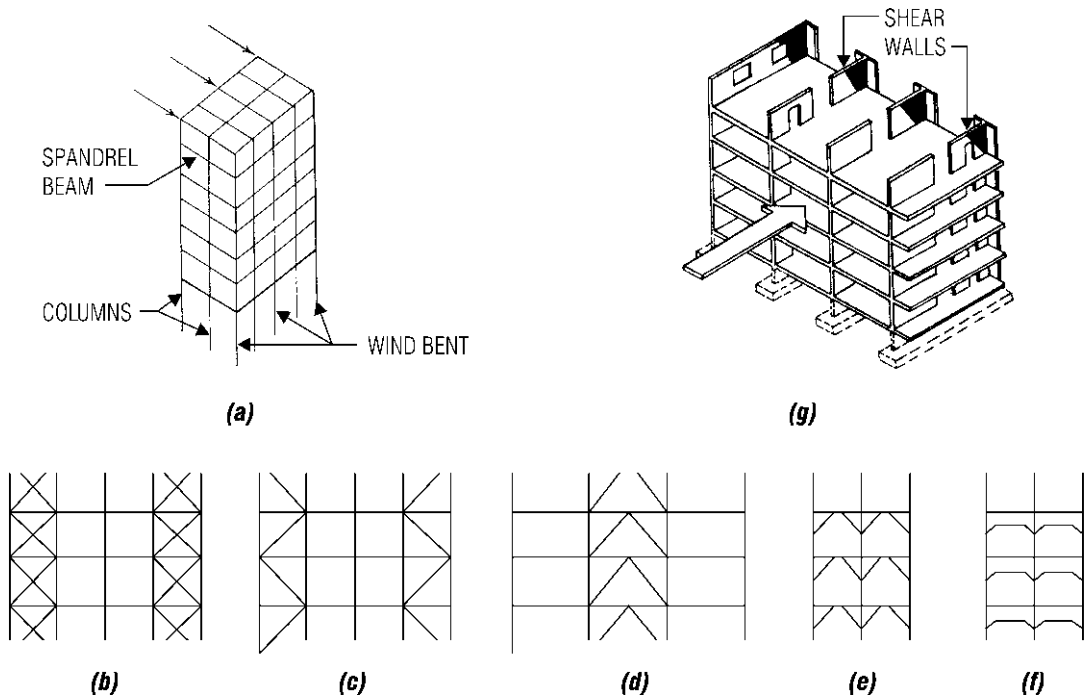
Building frame resists lateral forces with (a) wind bents or (g) shear walls or a combination of the two. Bents may be braced in any of several ways, including (b) X bracing, (c) K bracing, (d) inverted V bracing, (e) knee bracing, and (f) rigid connections.
